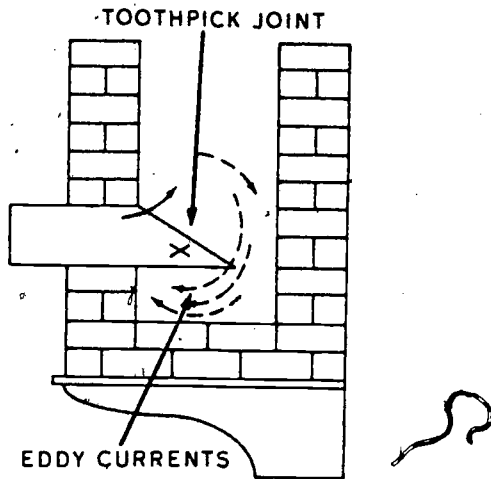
A toothpick joint installed in a chimney built on a shelf.
